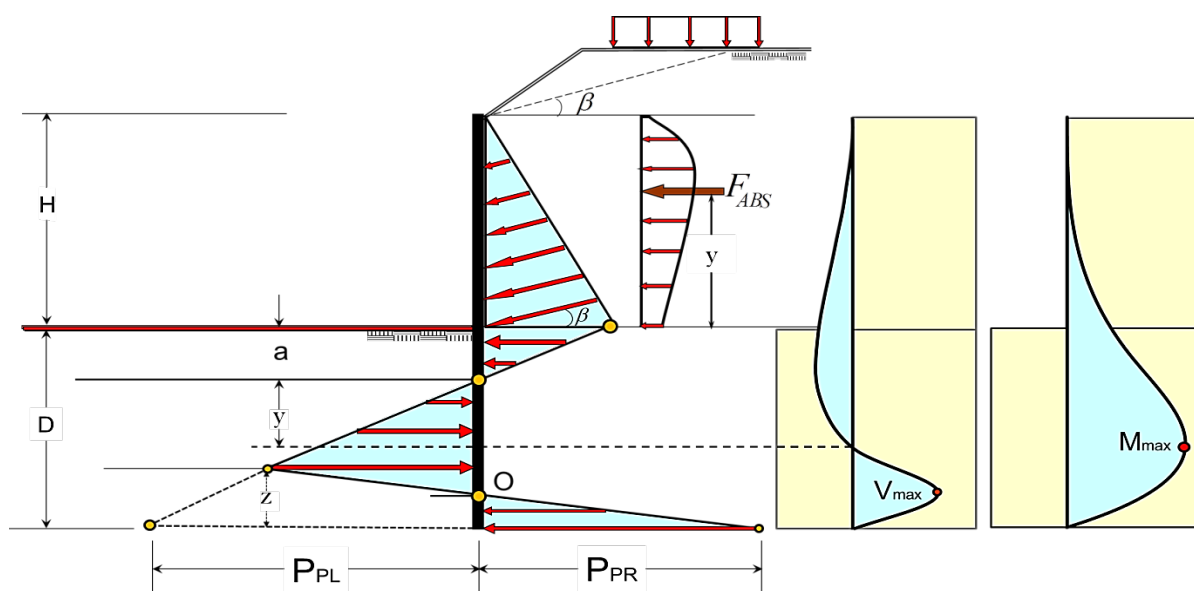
Sheet Pile Walls Idealized Pressure Distribution and Shear and Moment Diagram
